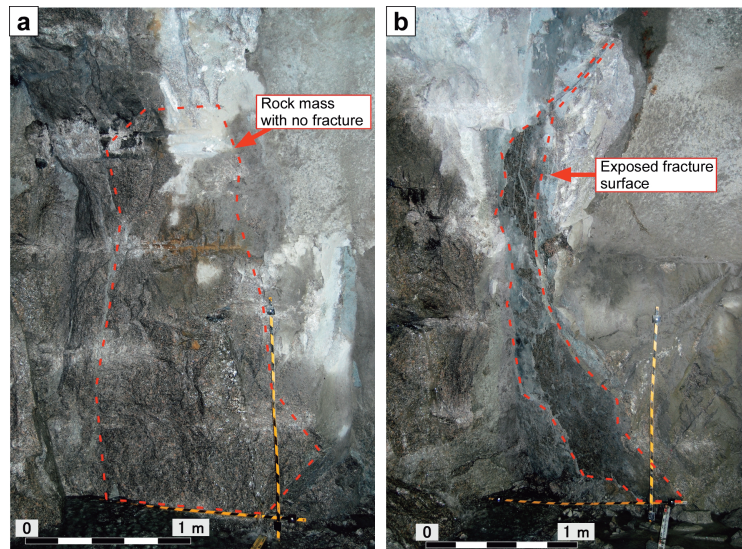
Surface shape of the gallery wall: (a) part of a rock mass with no fractures and (b) part of a rock mass with an exposed fracture surface.
